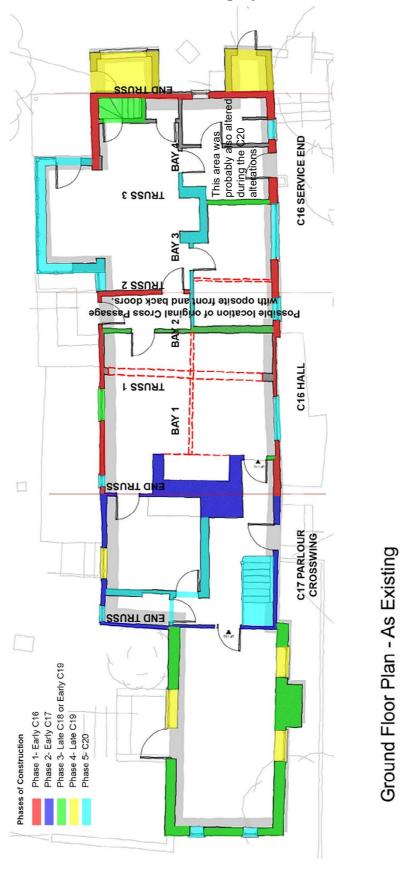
Ground Floor Phase Plan (Base Survey drawings by Shiel Architecture Ltd.)
